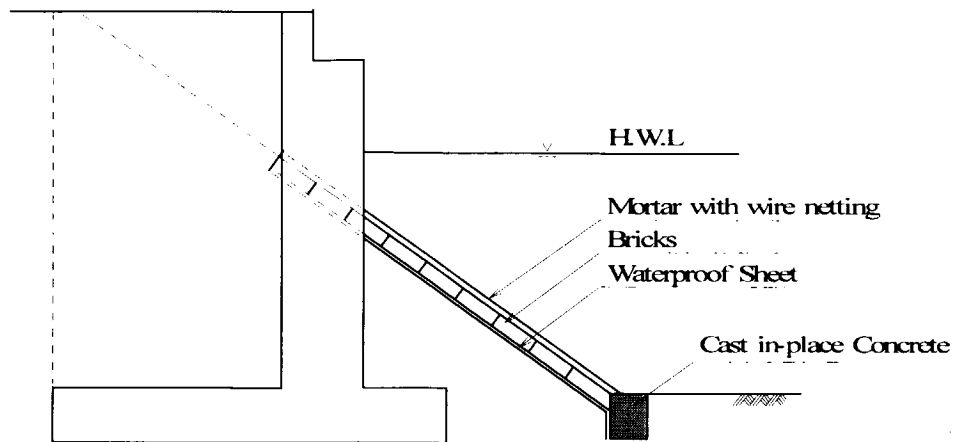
STANDARD TYPE OF REVETMENT
